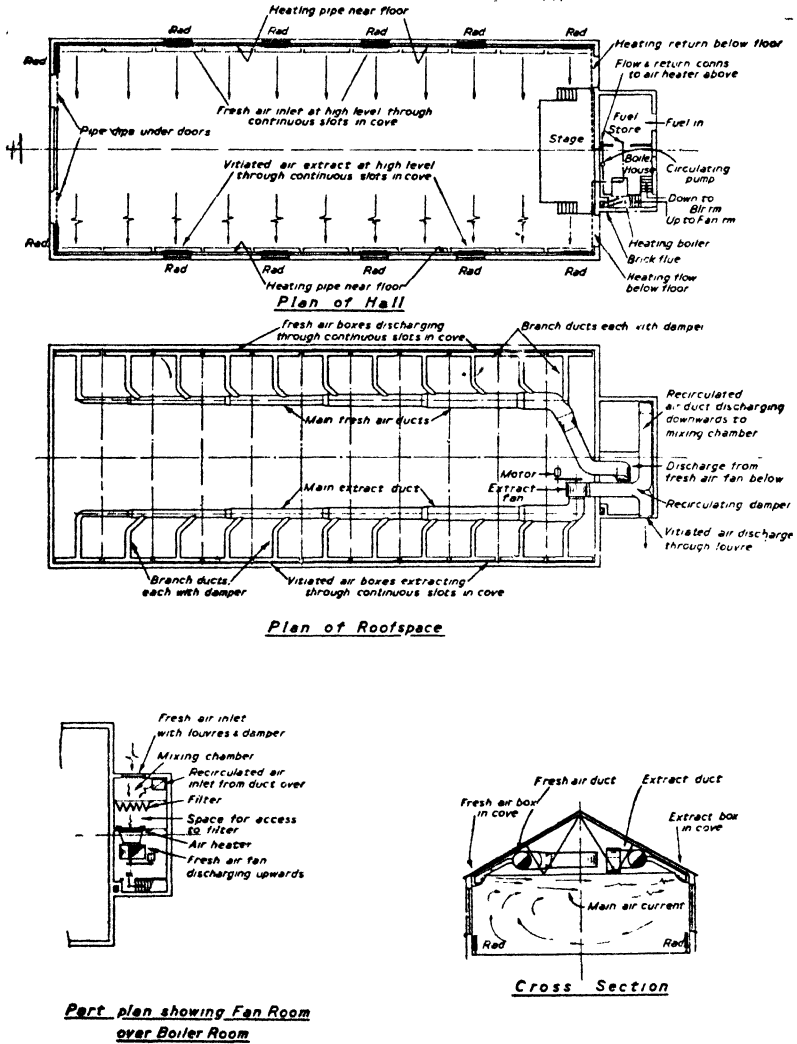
ASSEMBLY HALL SHOWING HEATING AND VENTILATING PLANT
